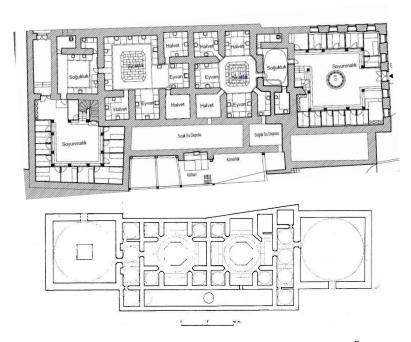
Upper image: Şengül Bathhouse plan schema, Ankara. (Karakuş, F.-Özcan, Z., 2022); lower image: Kızlarağası Bathhouse plan schema (Haskan, 1995: 56-60).
